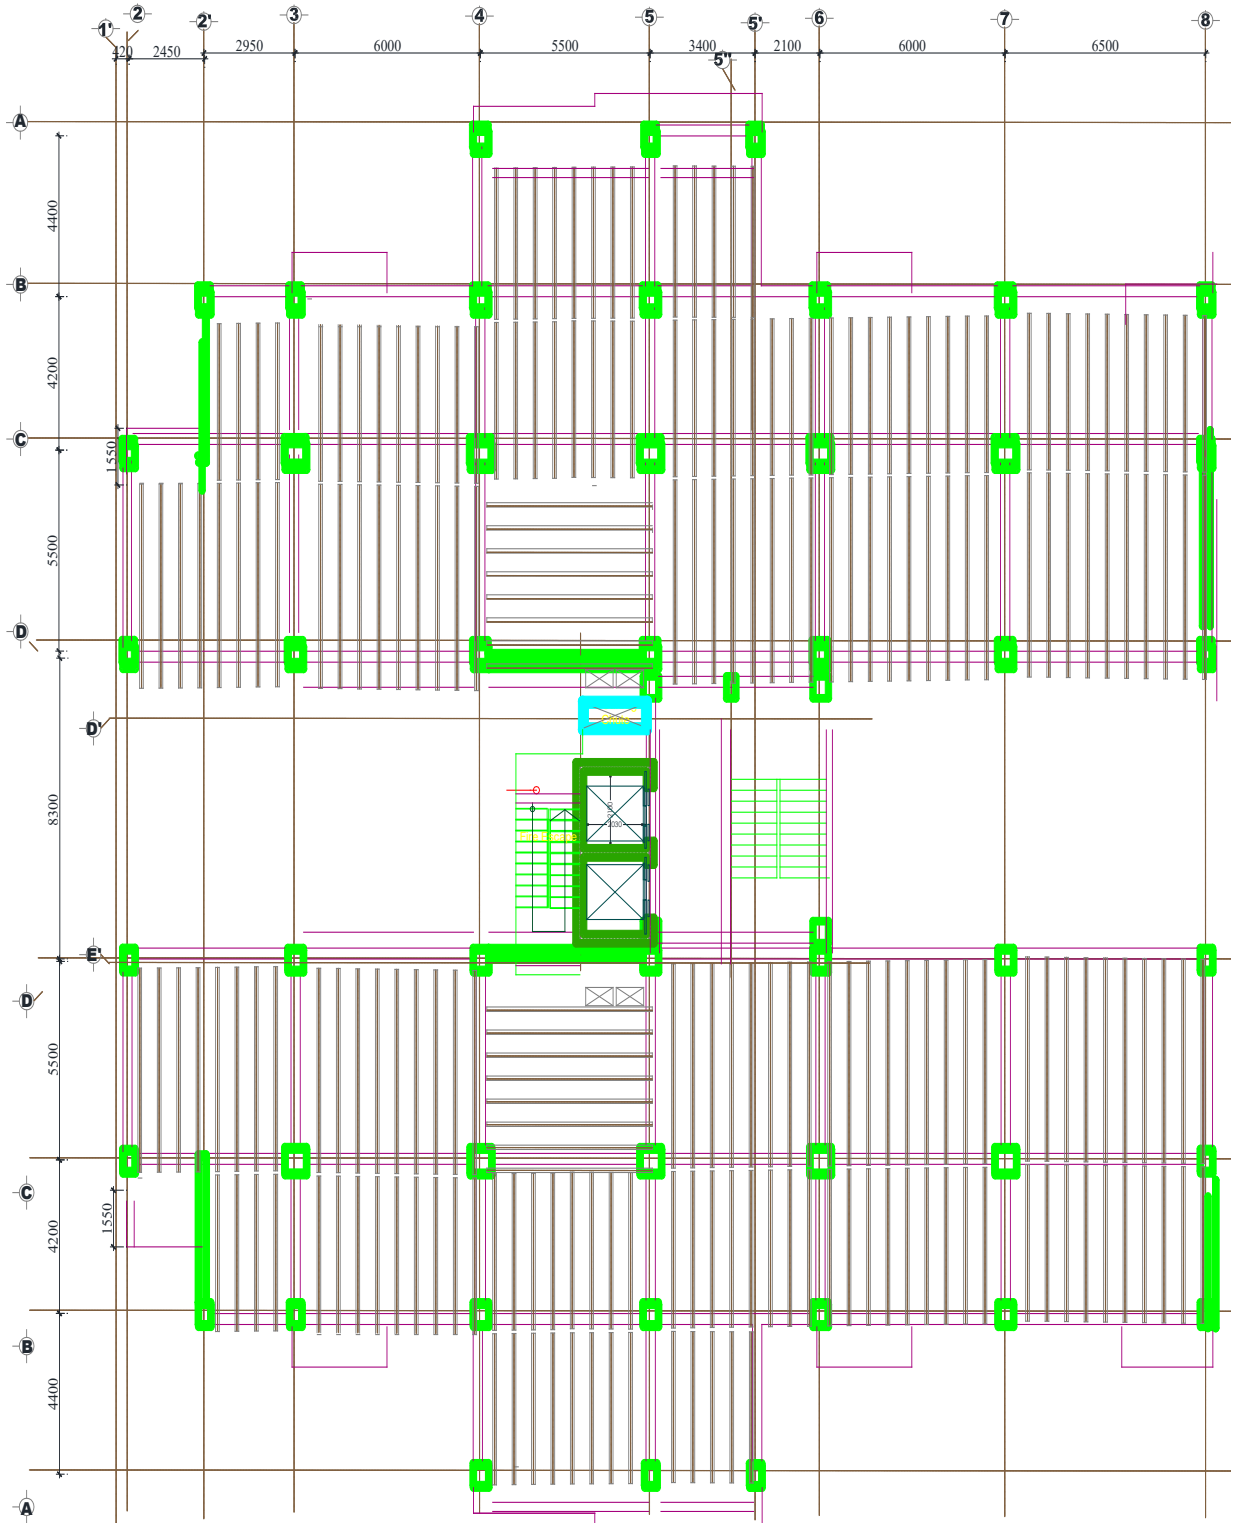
Typical floor structural system and rib layout from 2nd to 12th floor
